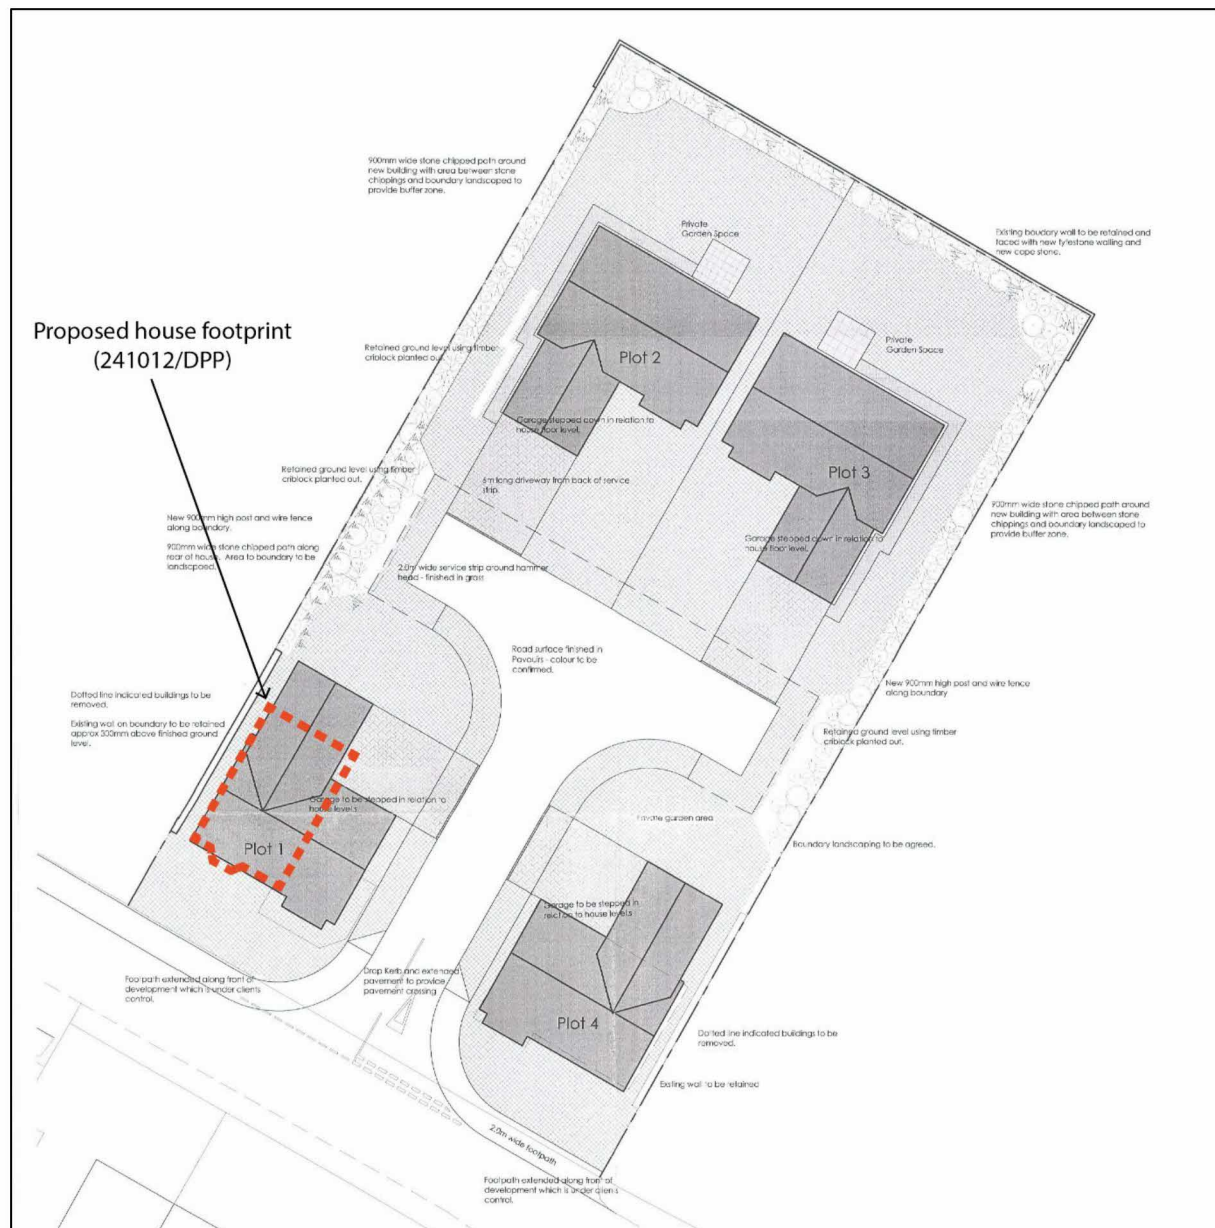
Approved Site Plan from planning application 131534, with mark-up showing the indicative location of the proposed house footprint (red dashed outline) (Source: ACC Application Website)
